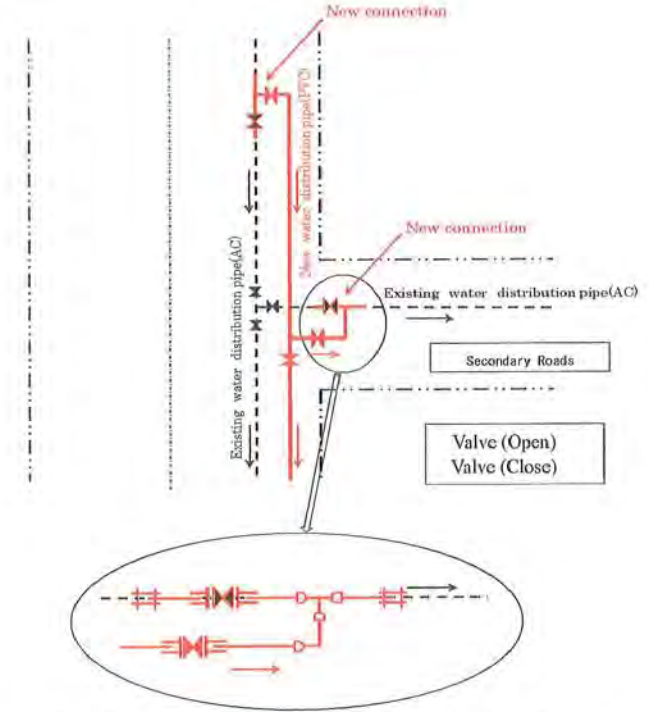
Conceptual diagram of connecting existing and new distribution pipe
